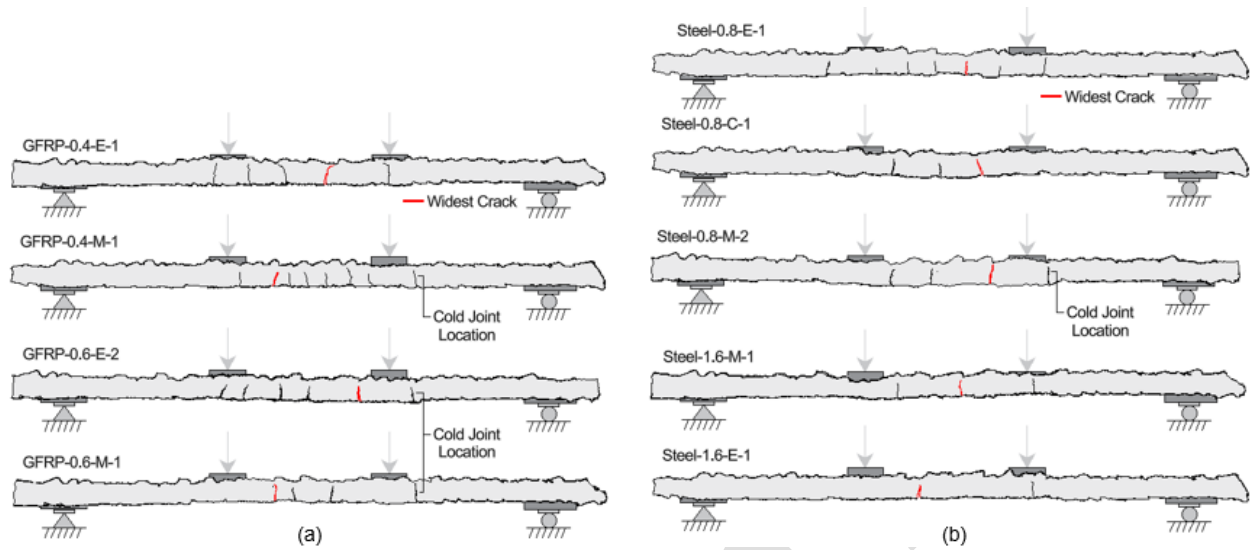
Typical crack distributions for each specimen type: (a) GFRP-reinforced wall panels, (b) steel-reinforced wall panels.
